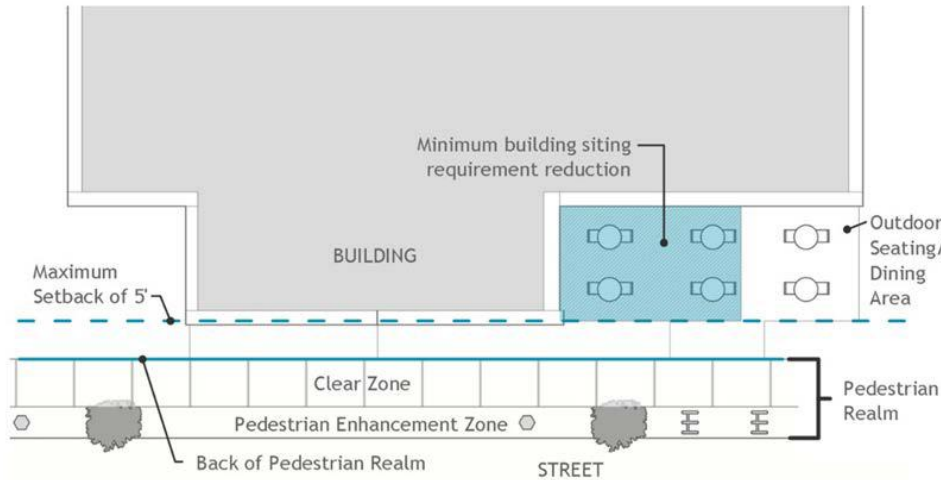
C: Minimum Frontage Requirements- Outdoor Seating and Dining
